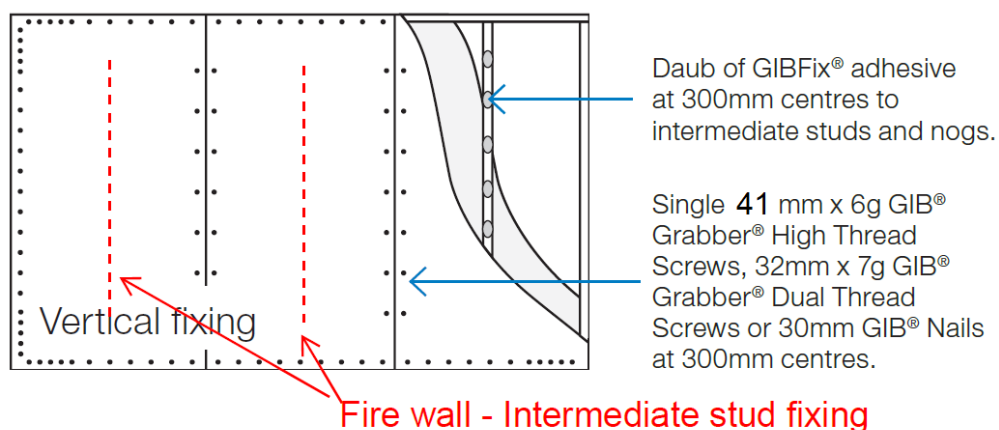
Plasterboard fixing details to timber framing (GIB, 2016)
